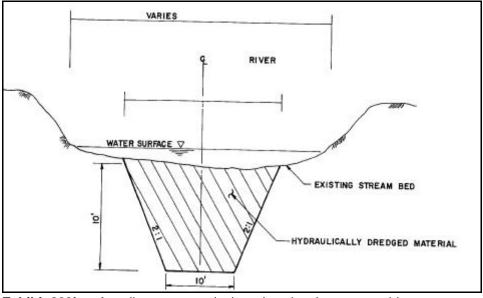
A sediment trap typical section showing areas subject to hydraulic dredging (Source: CBBEL Files)
